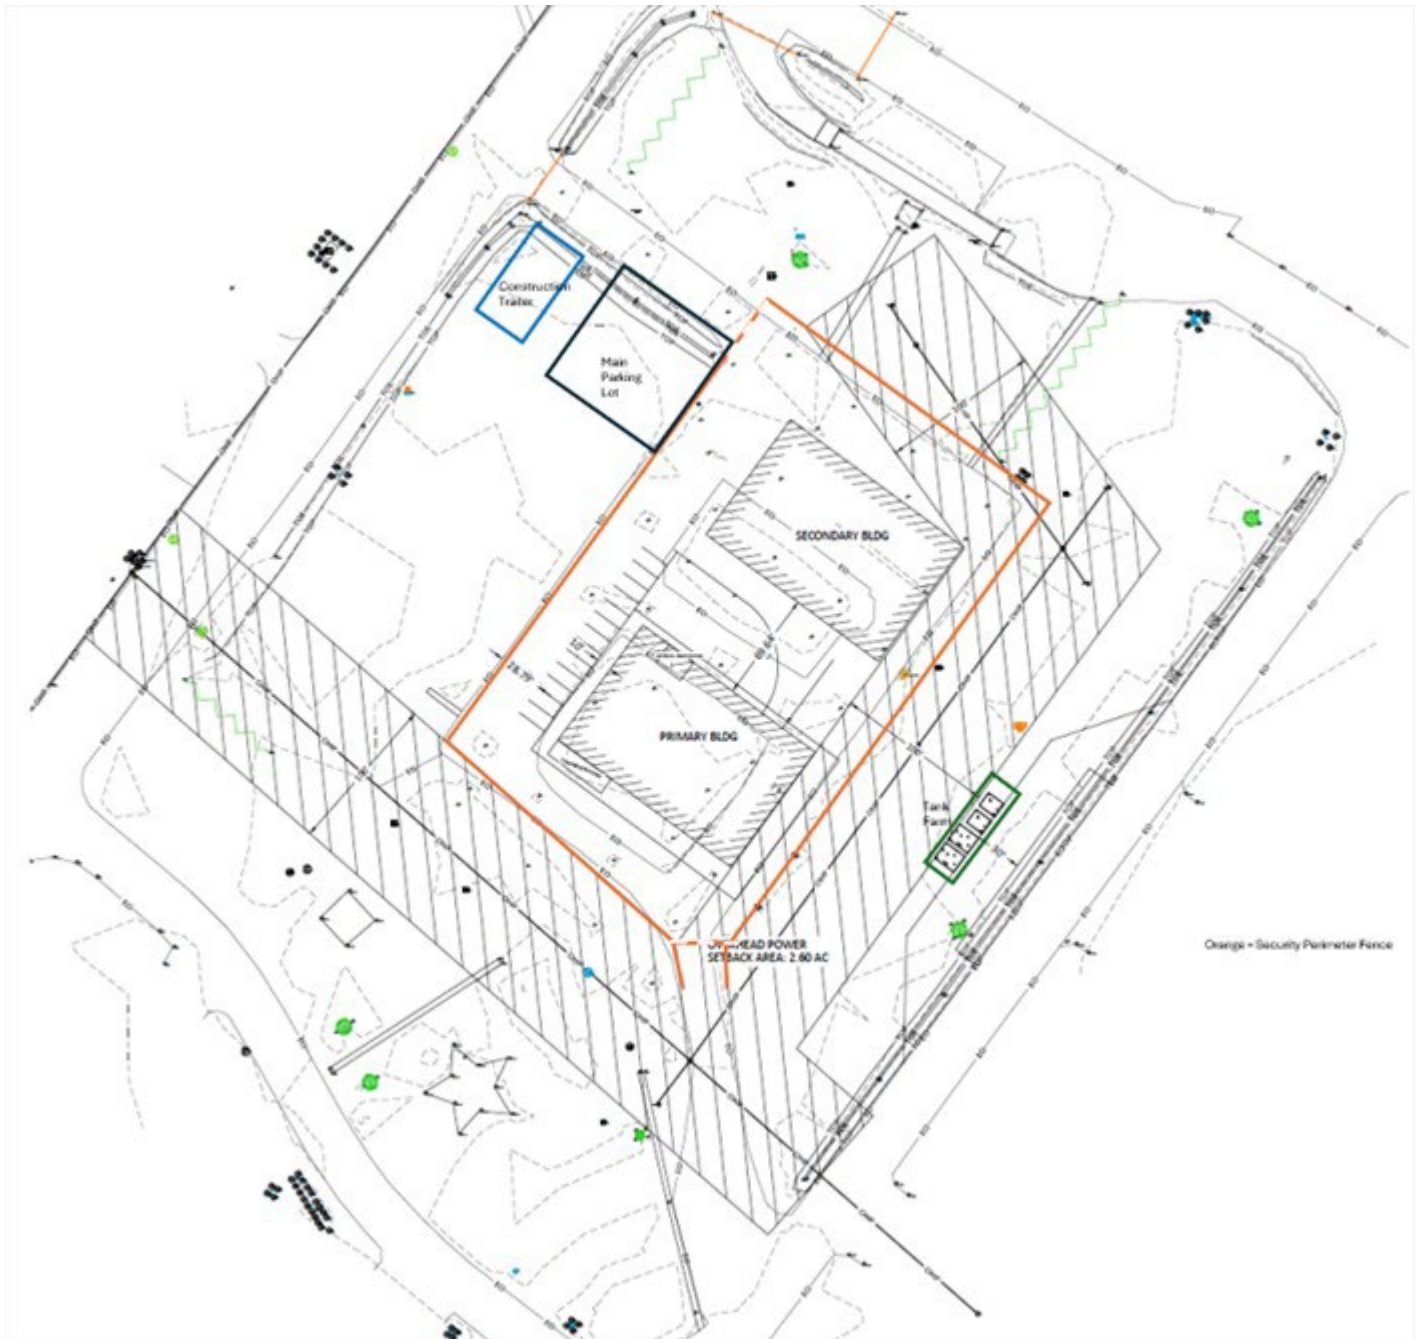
Site layout showing fence, tank farm, driveway, and parking lot locations.
